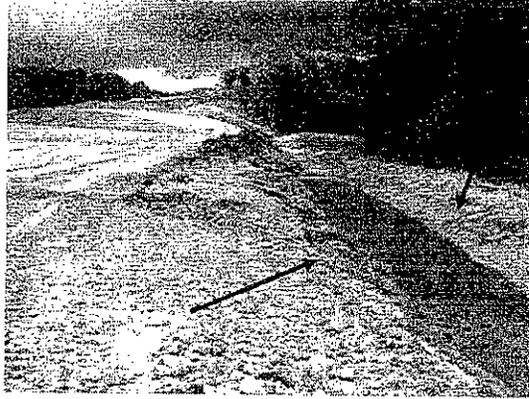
Slopes of sediment trap not stabilized at Sta. 1070+75
